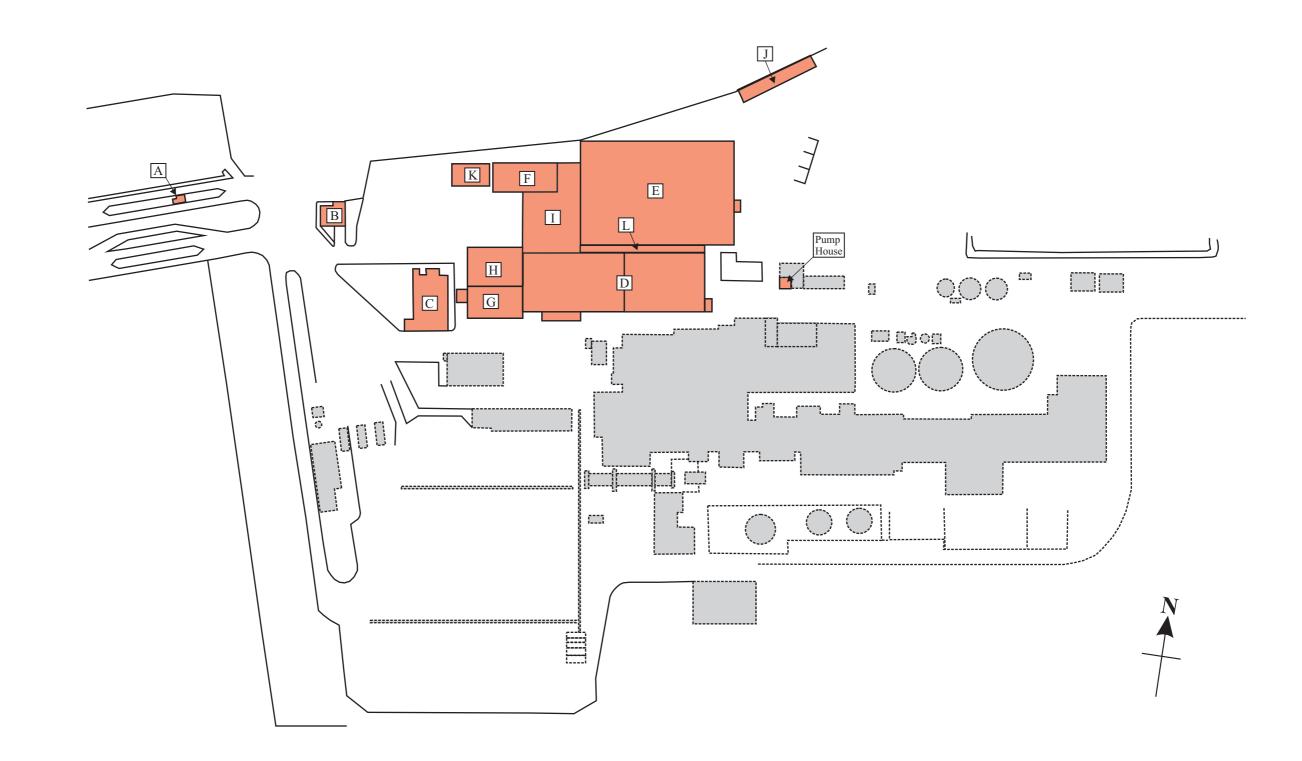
Plan showing the layout of the Buildings (shown in red) and the letters allocated them in this survey. The buildings shown in grey have been demolished. Not to Scale.
